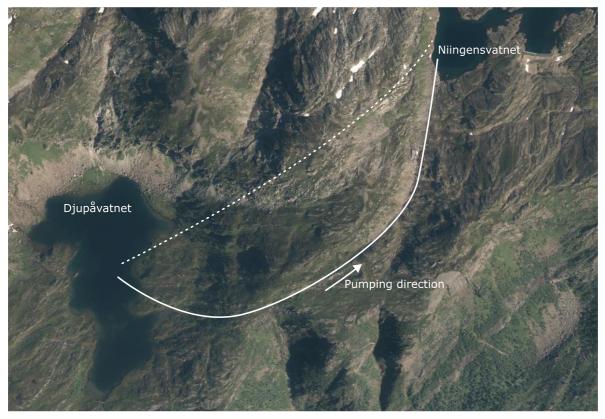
Proposed plan for the pipeline from Djupåvatnet to Niingensvatnet without a tunnel (constant line) or with a tunnel (dashed line [39]
